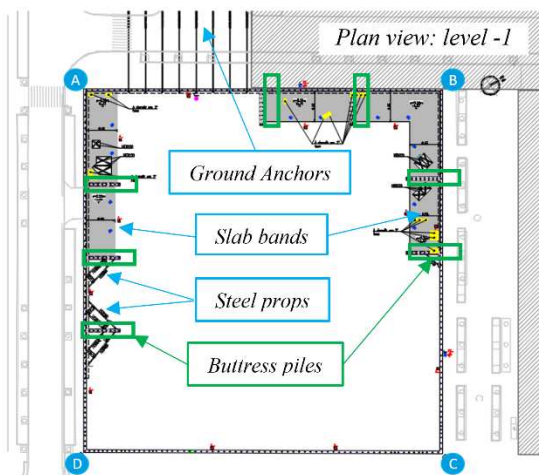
Design plan view of the peripheral earth retaining solution at level -1.
